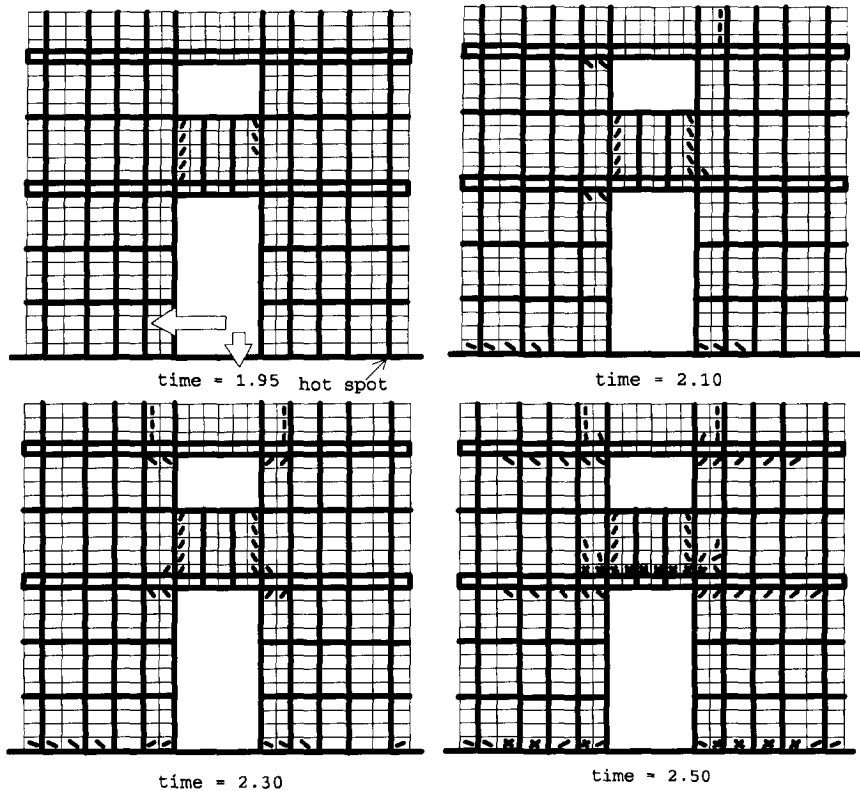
Crack patterns in the front wall of a two-storey house
